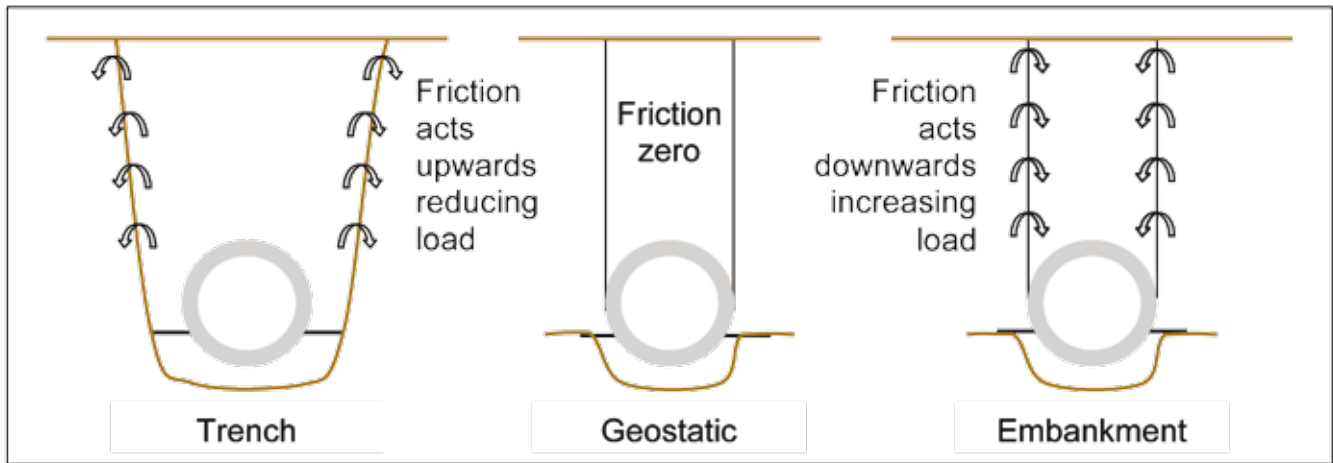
COMPARISON OF TRENCH, GEOSTATIC AND EMBANKMENT LOADING
